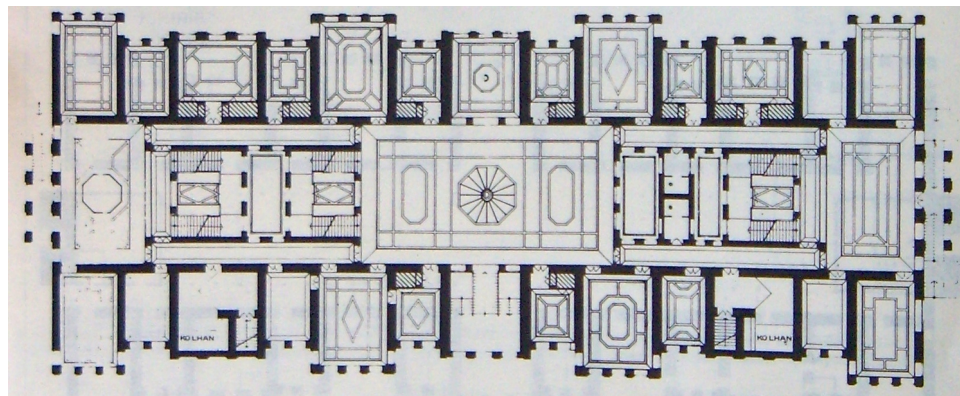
Twin Palace, ground plan first floor (Reproduction from Eldem 1983, 213).
